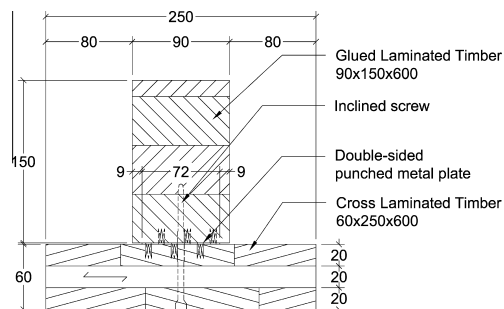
Cross-section of a shear test specimen (dimensions in mm).
